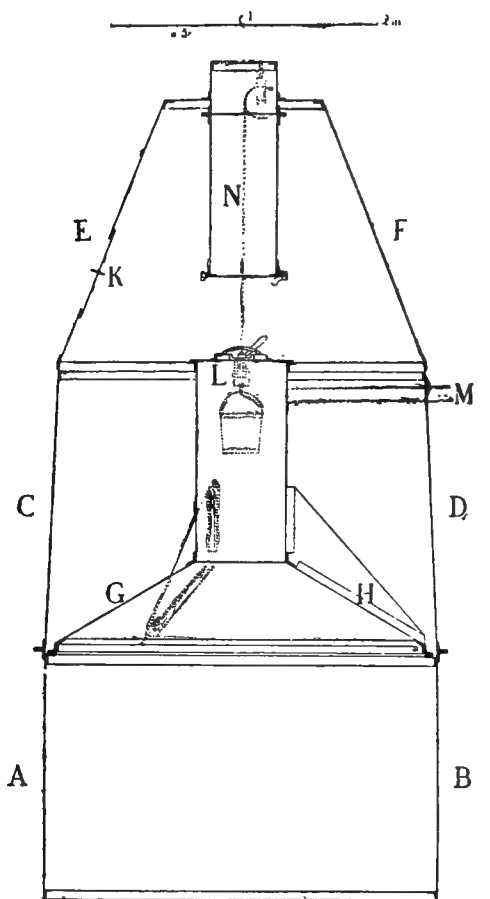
Transverse section of the apparatus used for the pneumatic foundations. A, B, foundation caisson; a plate-iron cylinder. C, D, E, F, movable plate-iron bell. G, H, plate-iron deck on which the excavation spoil is heaped to balance the under pressure within the caisson. K, entrance for workmen, and opening for the removal of the excavation spoil. L, air-lock door giving access to the caisson. M, inlet pipe for the compressed air. N, movable pipe for the introduction of the béton.
